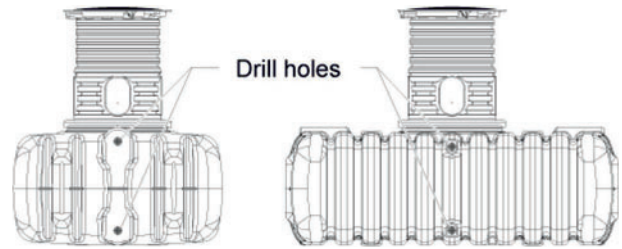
Drill holes for interconnecting multiple tanks – FLAT
